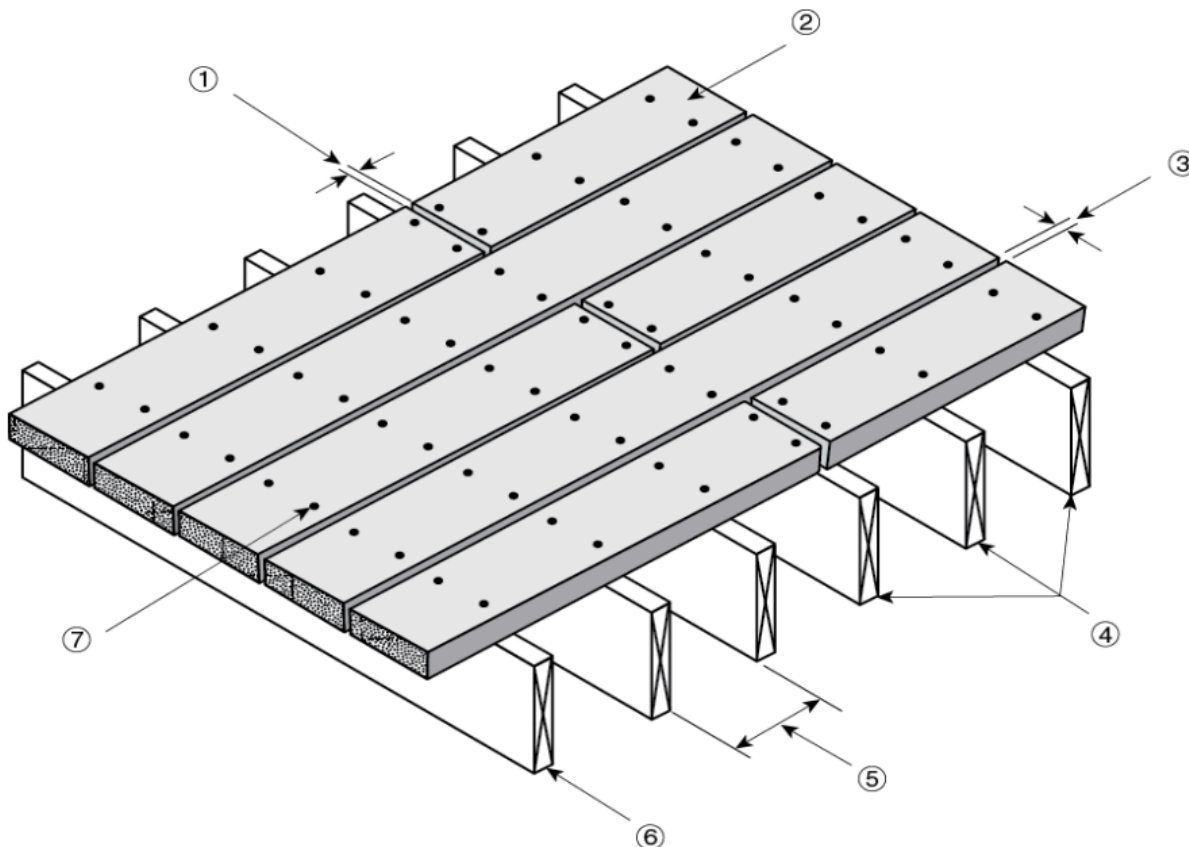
Installation details for Inteplast Deck and Wolf Serenity Deck, solid profile
